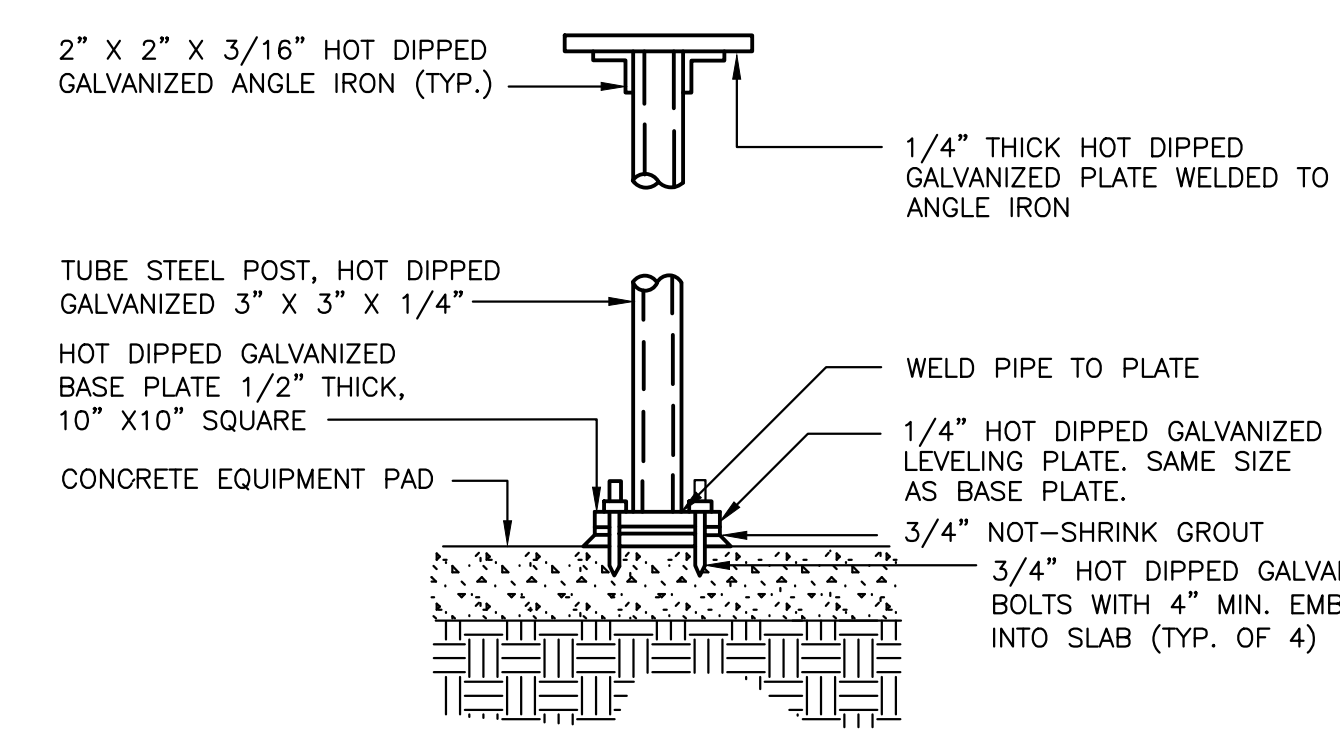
DETAIL-TYPICAL PIPING ON ROOF SUPPORT
